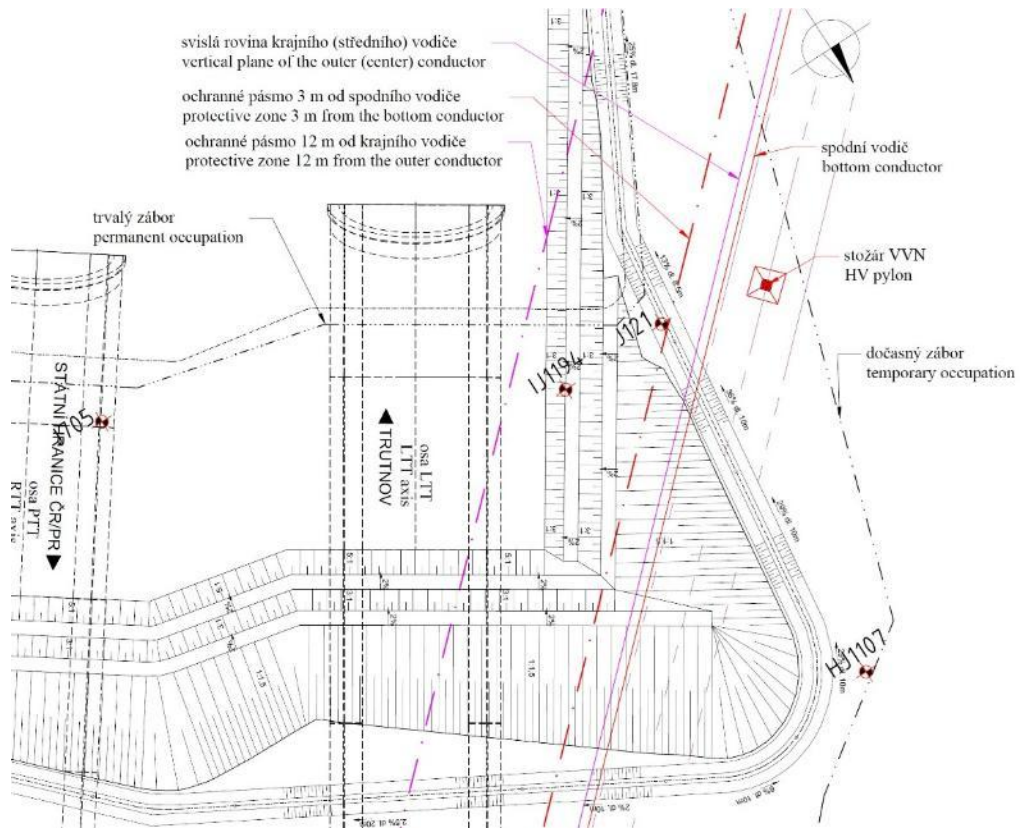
Cutout of a plan view of the construction pit with highlighted VHV protective zones
